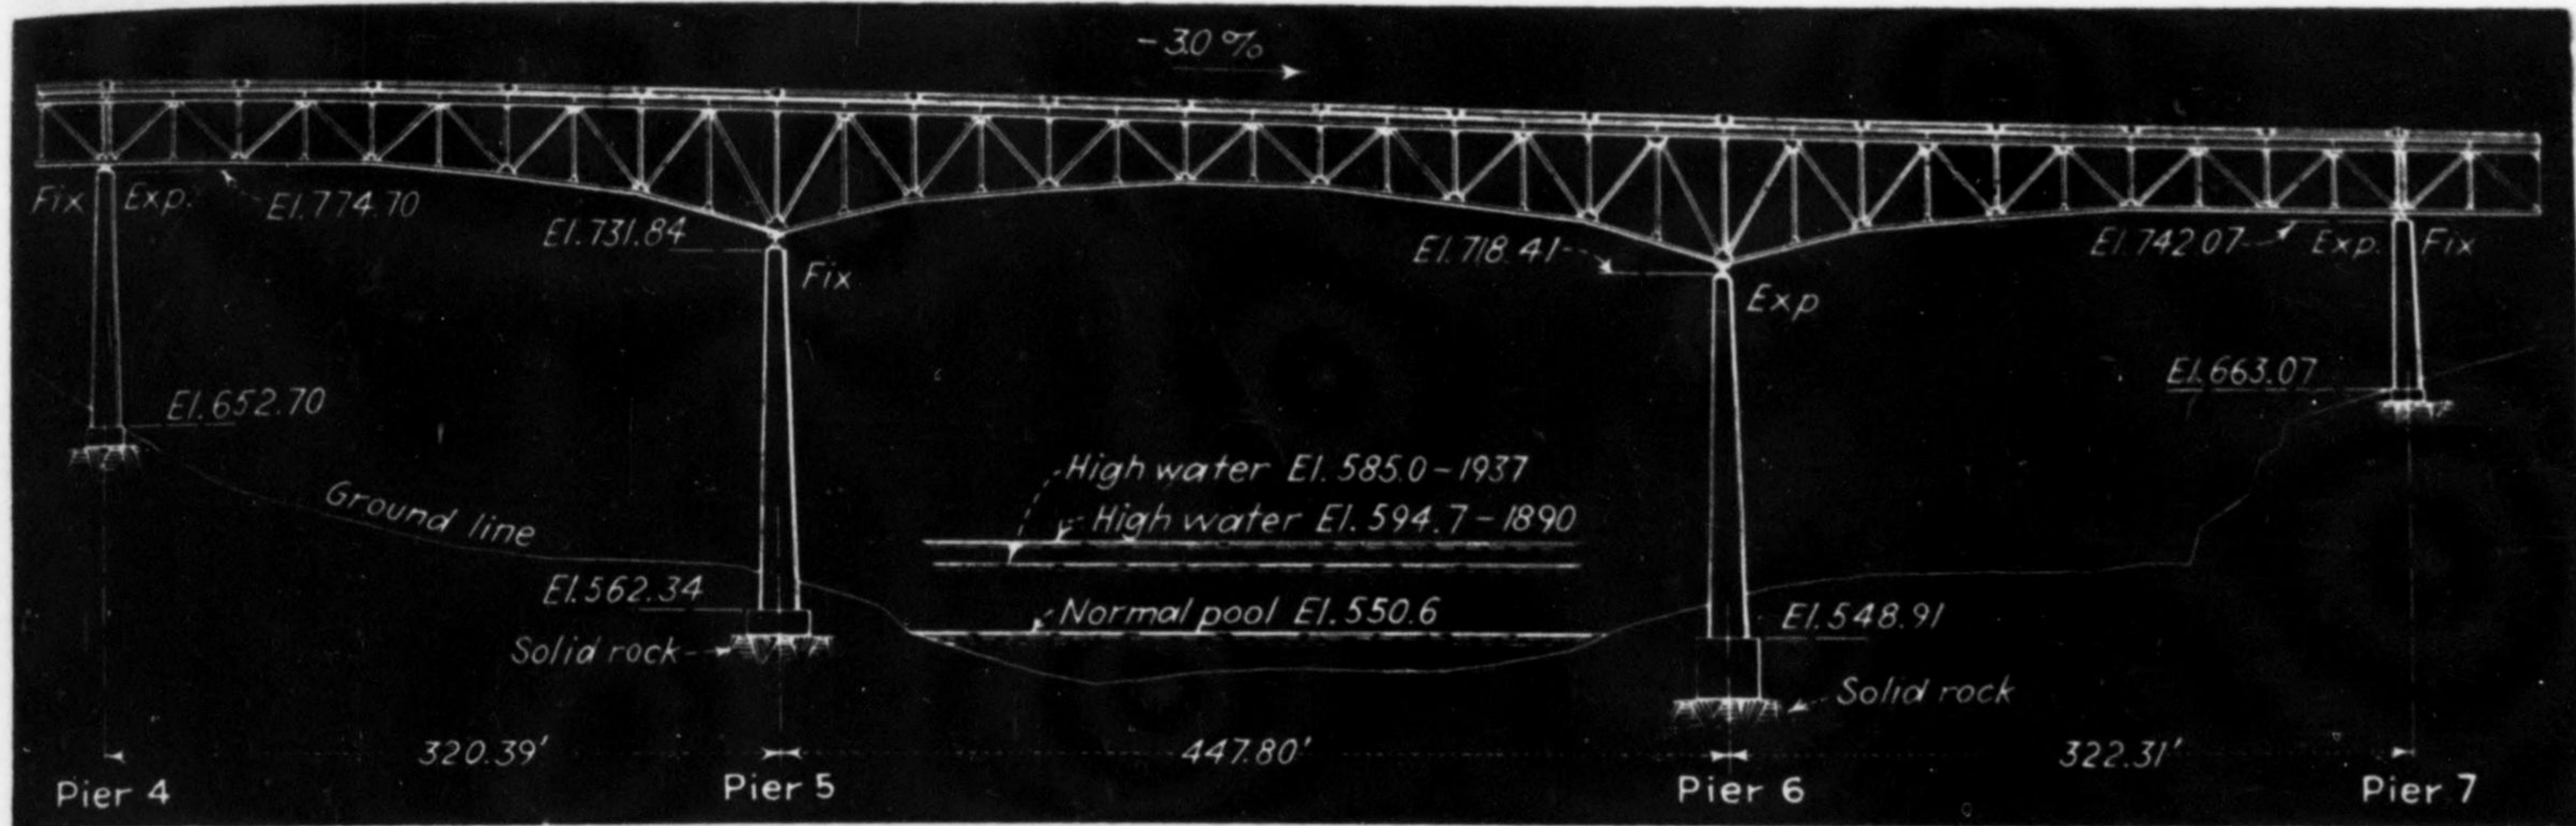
Central portion of bridge is a three-span continuous truss with a 448-ft. center span and 320-ft. side spans. In addition, there will be two 192-ft. steel spans and six 50-ft., reinforced-concrete and girder units.
